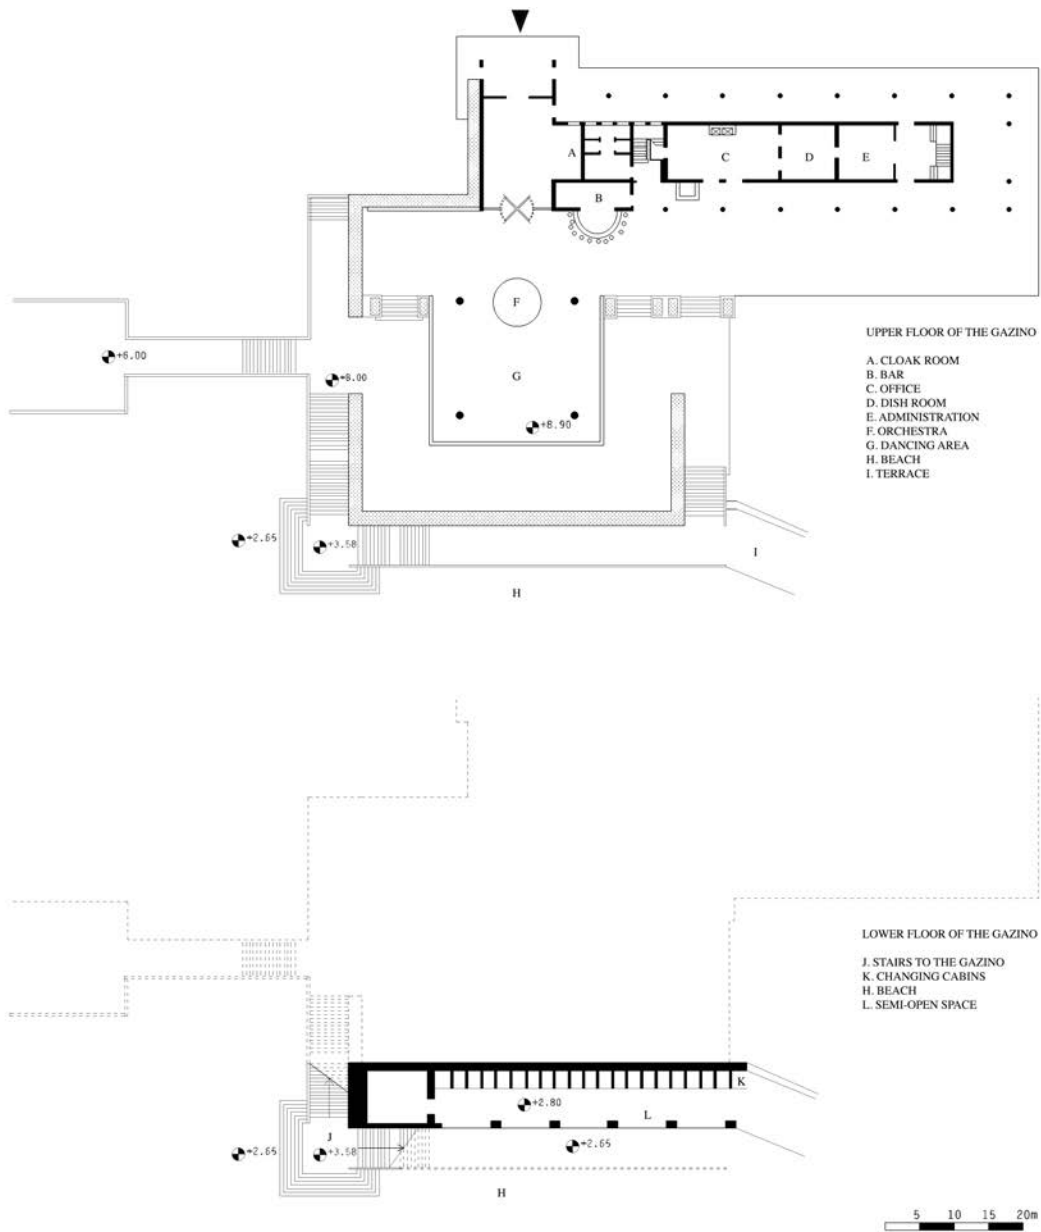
Floor plans of the Gazino: orchestra, bar, dancing area and access to the terrace in the upper floor; changing cabins with direct access to the beach in the lower floor. (Reproduced and simplified drawings of Rüknettin Güney's design, 1938). Original drawings from: Atatürk Library.
